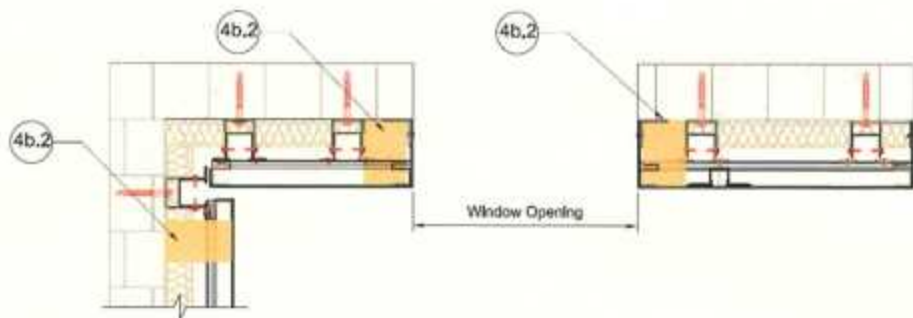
"Alucopanel" U.S.A. FR-A2 non-load-bearing exterior wall cladding assembly Fire break placement
